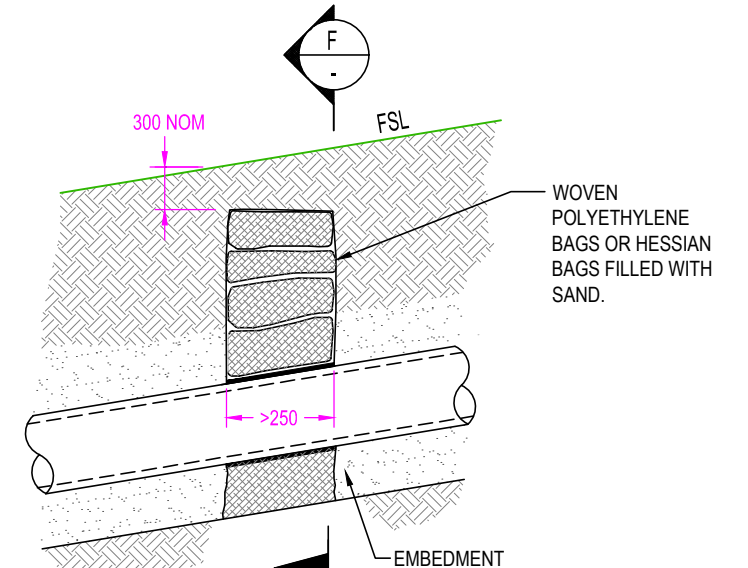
E: BAGGED TRENCH STOP (SECTION)
